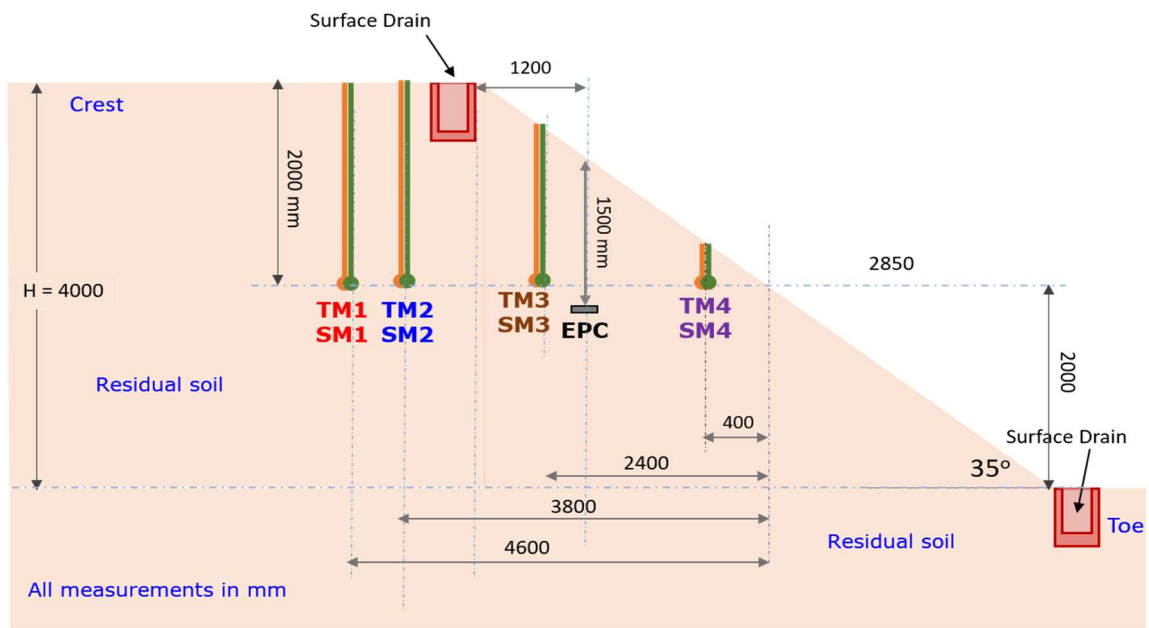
Plan view of slopes at pilot study site with instrumentation locations
